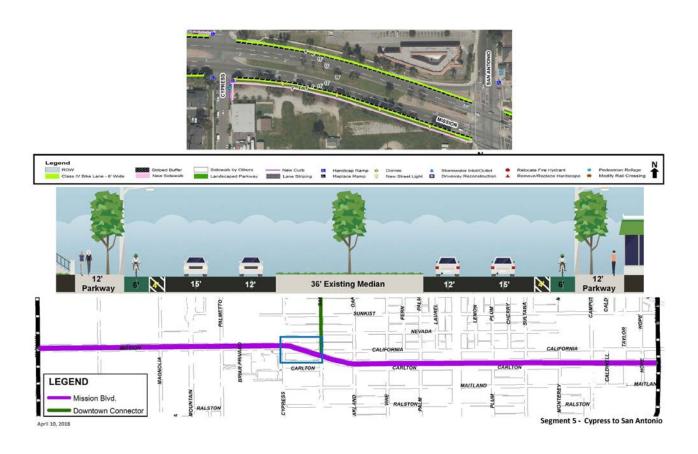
Exhibit A Mission Blvd. Bike and Pedestrian Concept Plan
